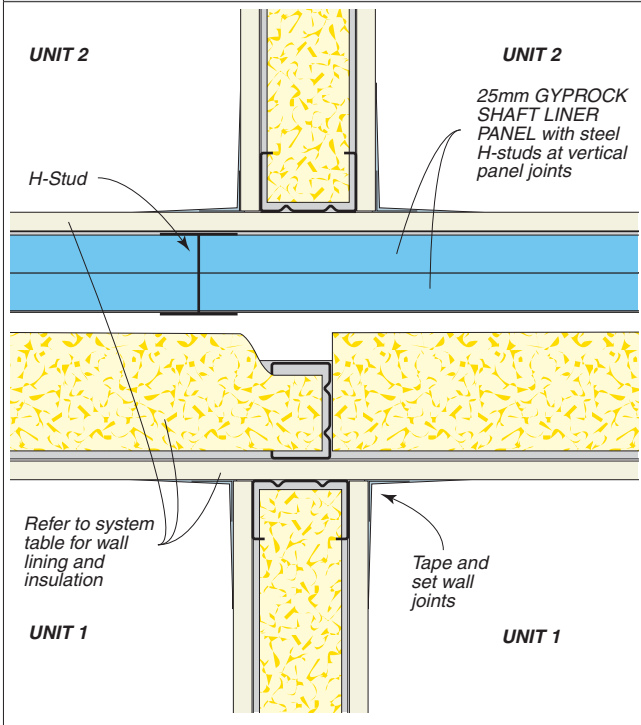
TYPICAL JUNCTION OF STRATAWALL™ WITH CORRIDOR WALL
